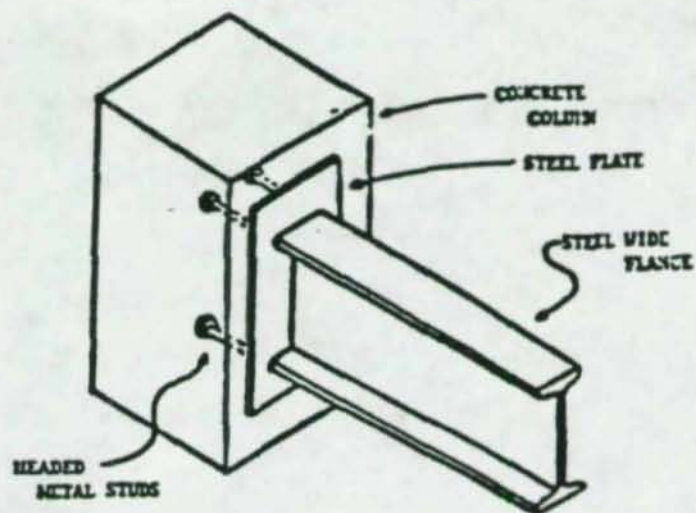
Typical steel beam - concrete column connection<sup>(14)</sup>
